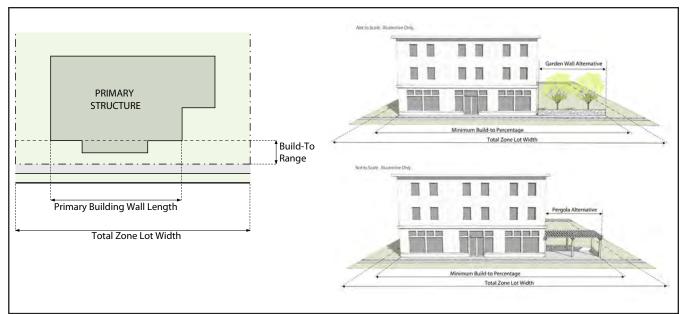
Build-To Requirement and Build-To Requirement Alternatives.
